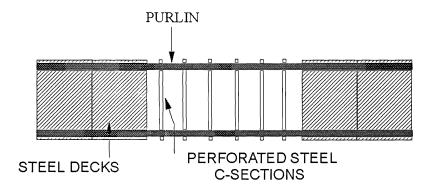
Plan view of bottom flange bracing for experiments braced on top and bottom flanges.
